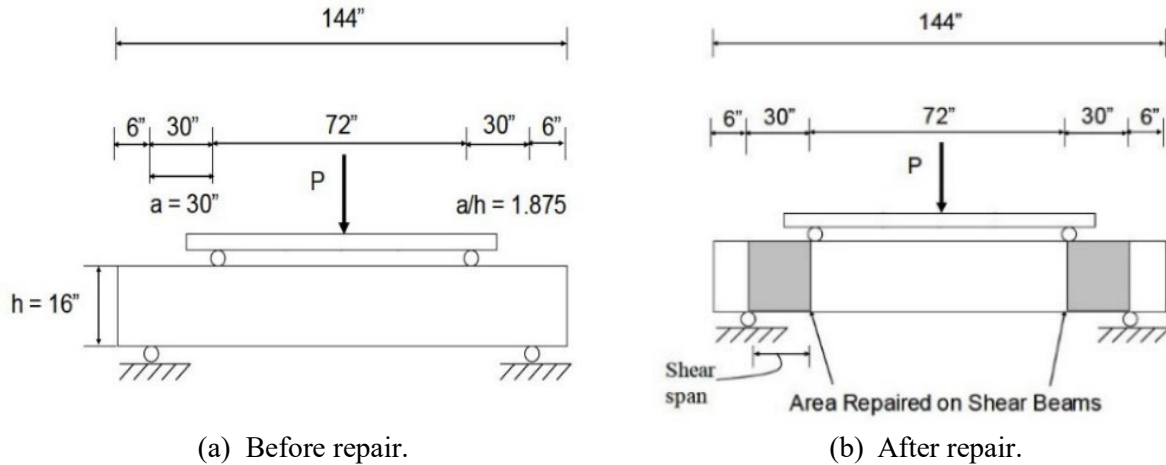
Shear test setup for the railroad bridge project, Moorefield, West Virginia [35].
